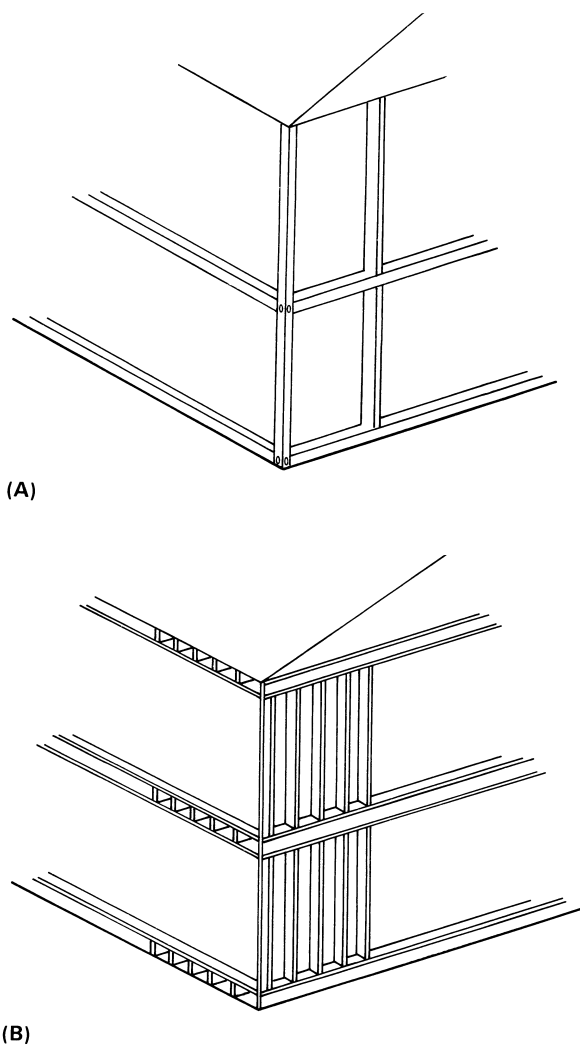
(A) Early balloon or barn construction, and (B) modern frame construction
